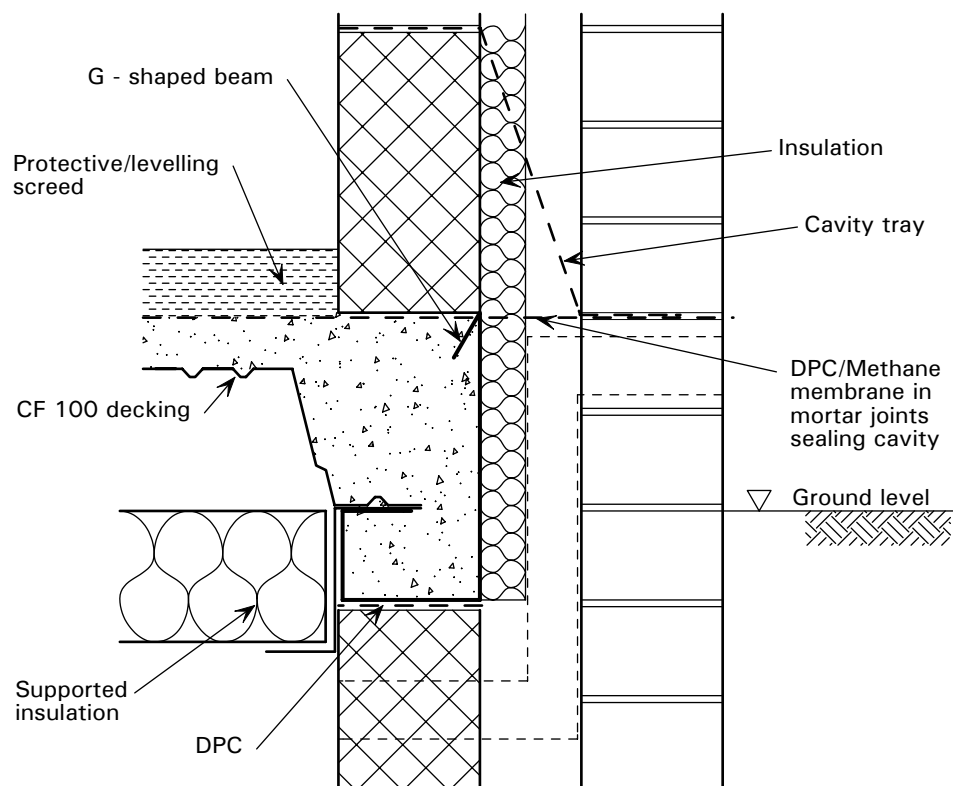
Cross-section through a G-shaped edge beam showing radon proof membrane to seal across external cavity wall
